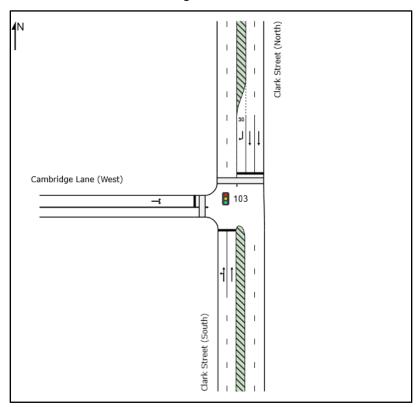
SIDRA intersection layout - Clark Street / Cambridge Lane (site accessway)
